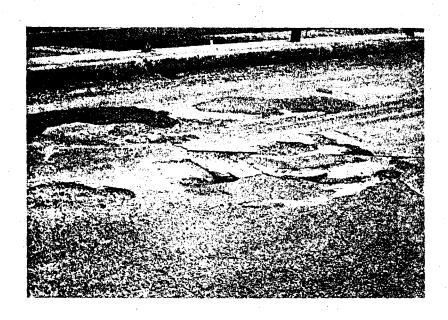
A typical delaminated area of a bridge deck in the last stages of deterioration.
